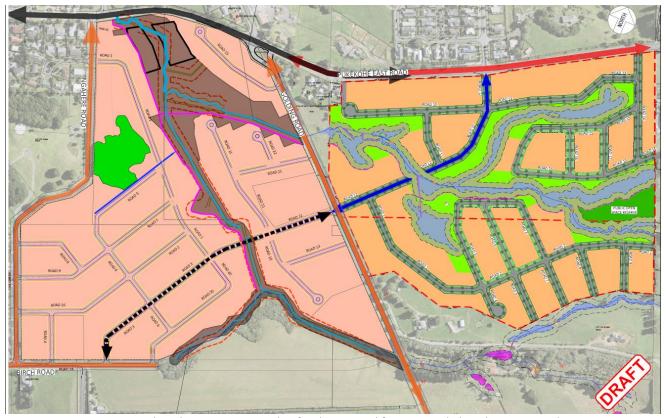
Combined Concept Masterplan for the Site and for Proposed Plan Change 76 to the west.
